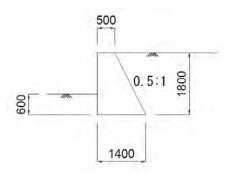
Back Surface Inclined Gravity Wall
